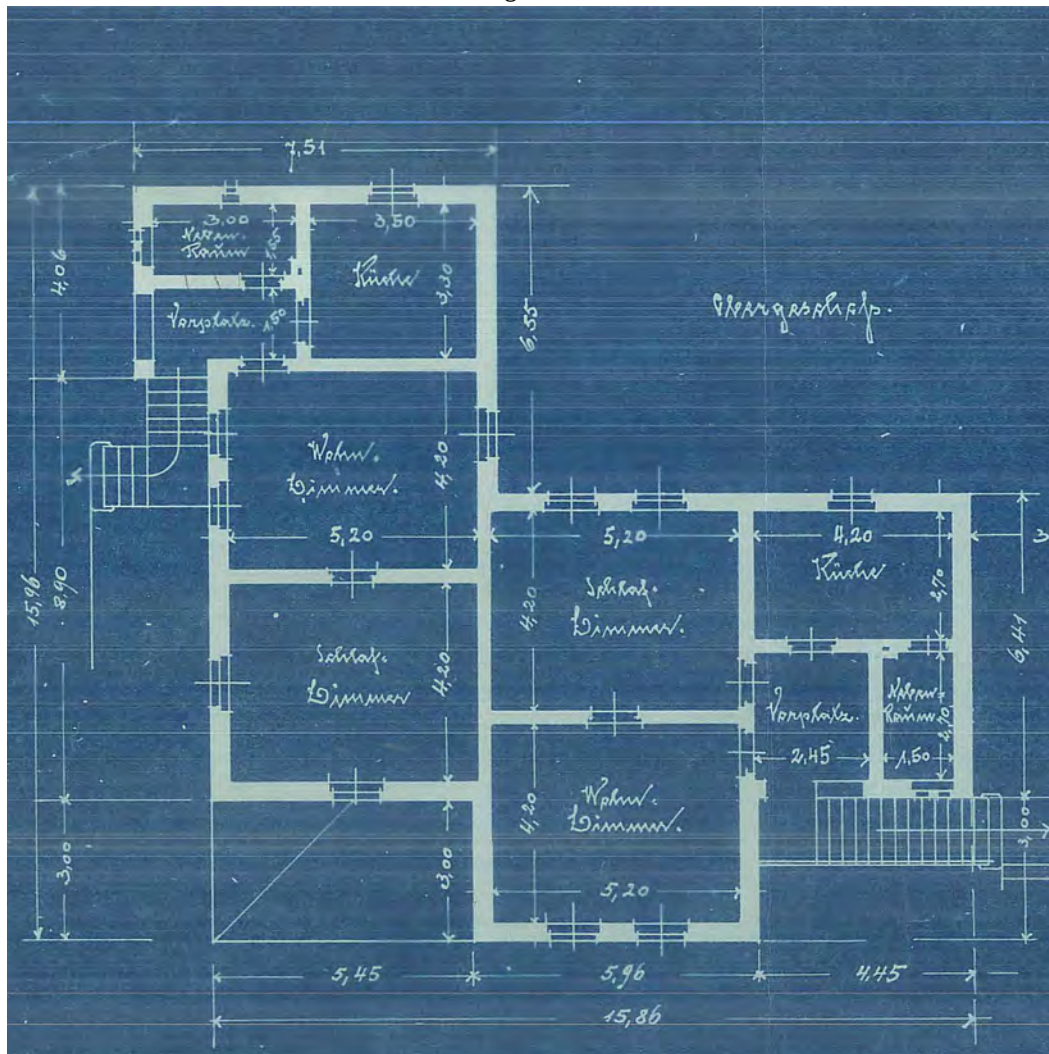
House m Floor Plan Option A, July 1909. NAN: Plan No. 4850.
